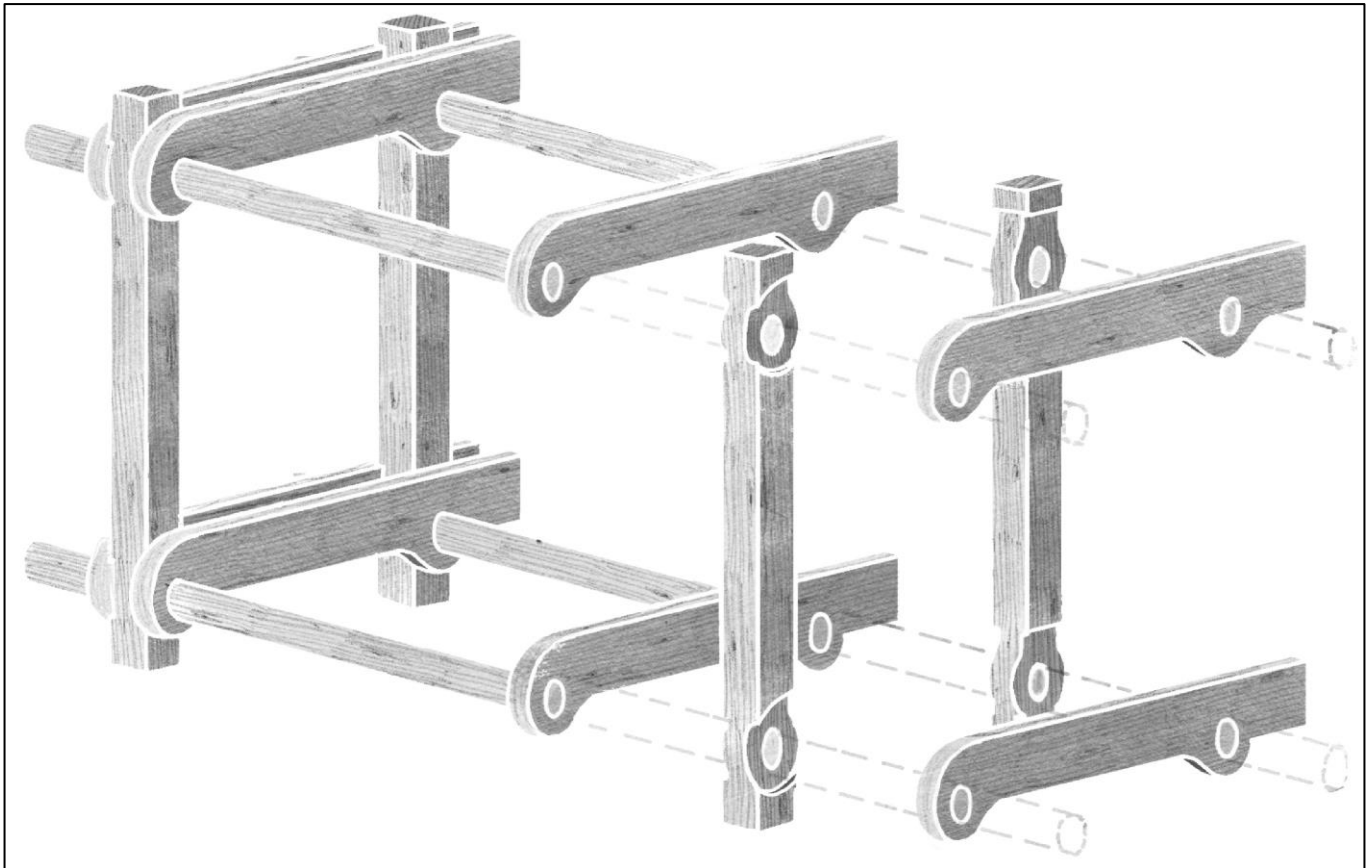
Four beam-to-column connections in an outer section of the Tamedia office building, Zurich, Switzerland, with assembled connection details (left) and exploded details (right). Drawing by Eva Kévers-Leclercq.
